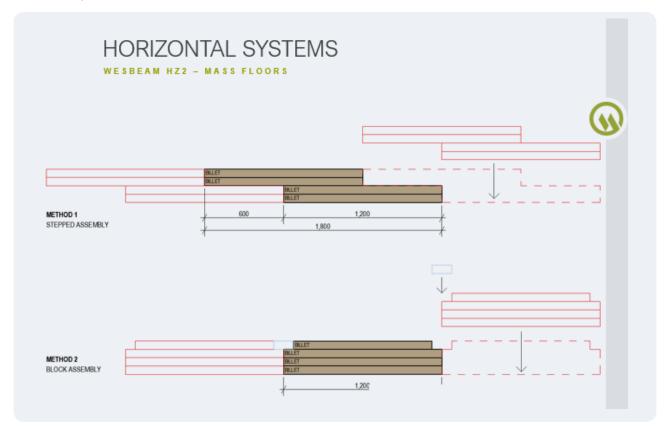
Possible joining arrangements for LVL mass floor panels. (Image: Wesbeam)
